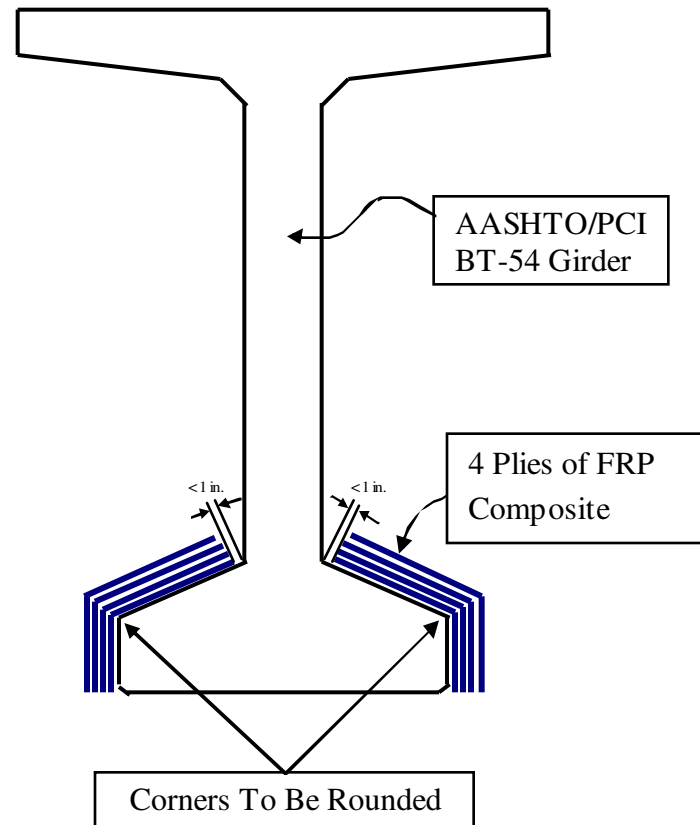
FRP Layout - Cross Section A and B Profile (Swenson 2003a)
